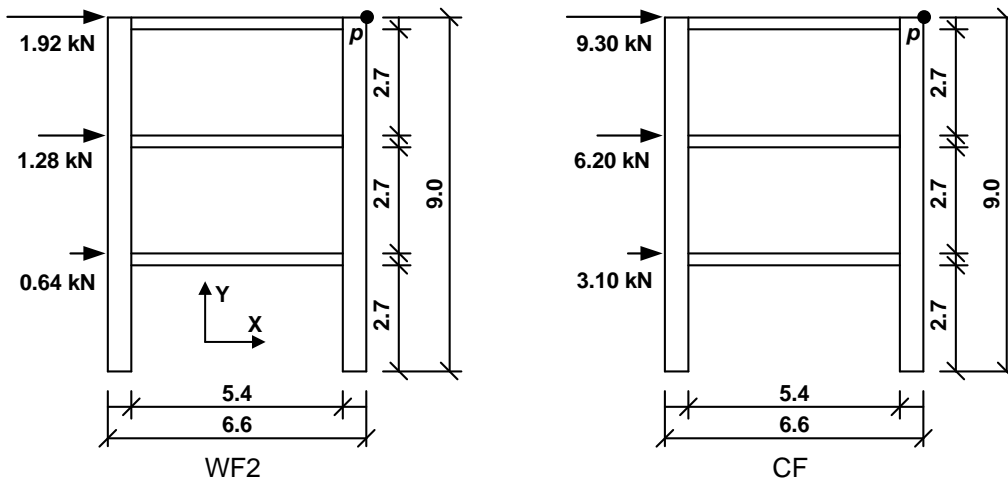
Structural dimensions and load conditions of wood frame WF2 and concrete frame CF
